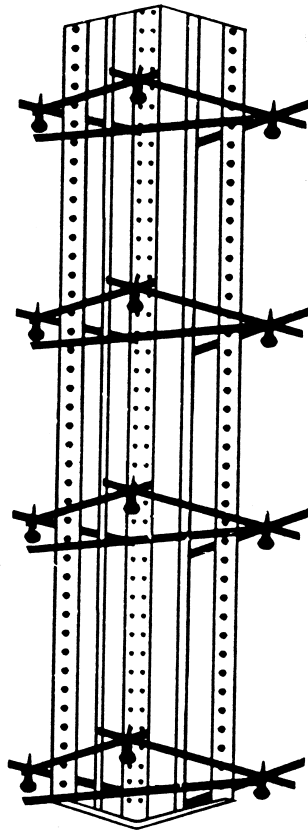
C : Column Form with Adjustable Shuttering Wall Form Type Panels
